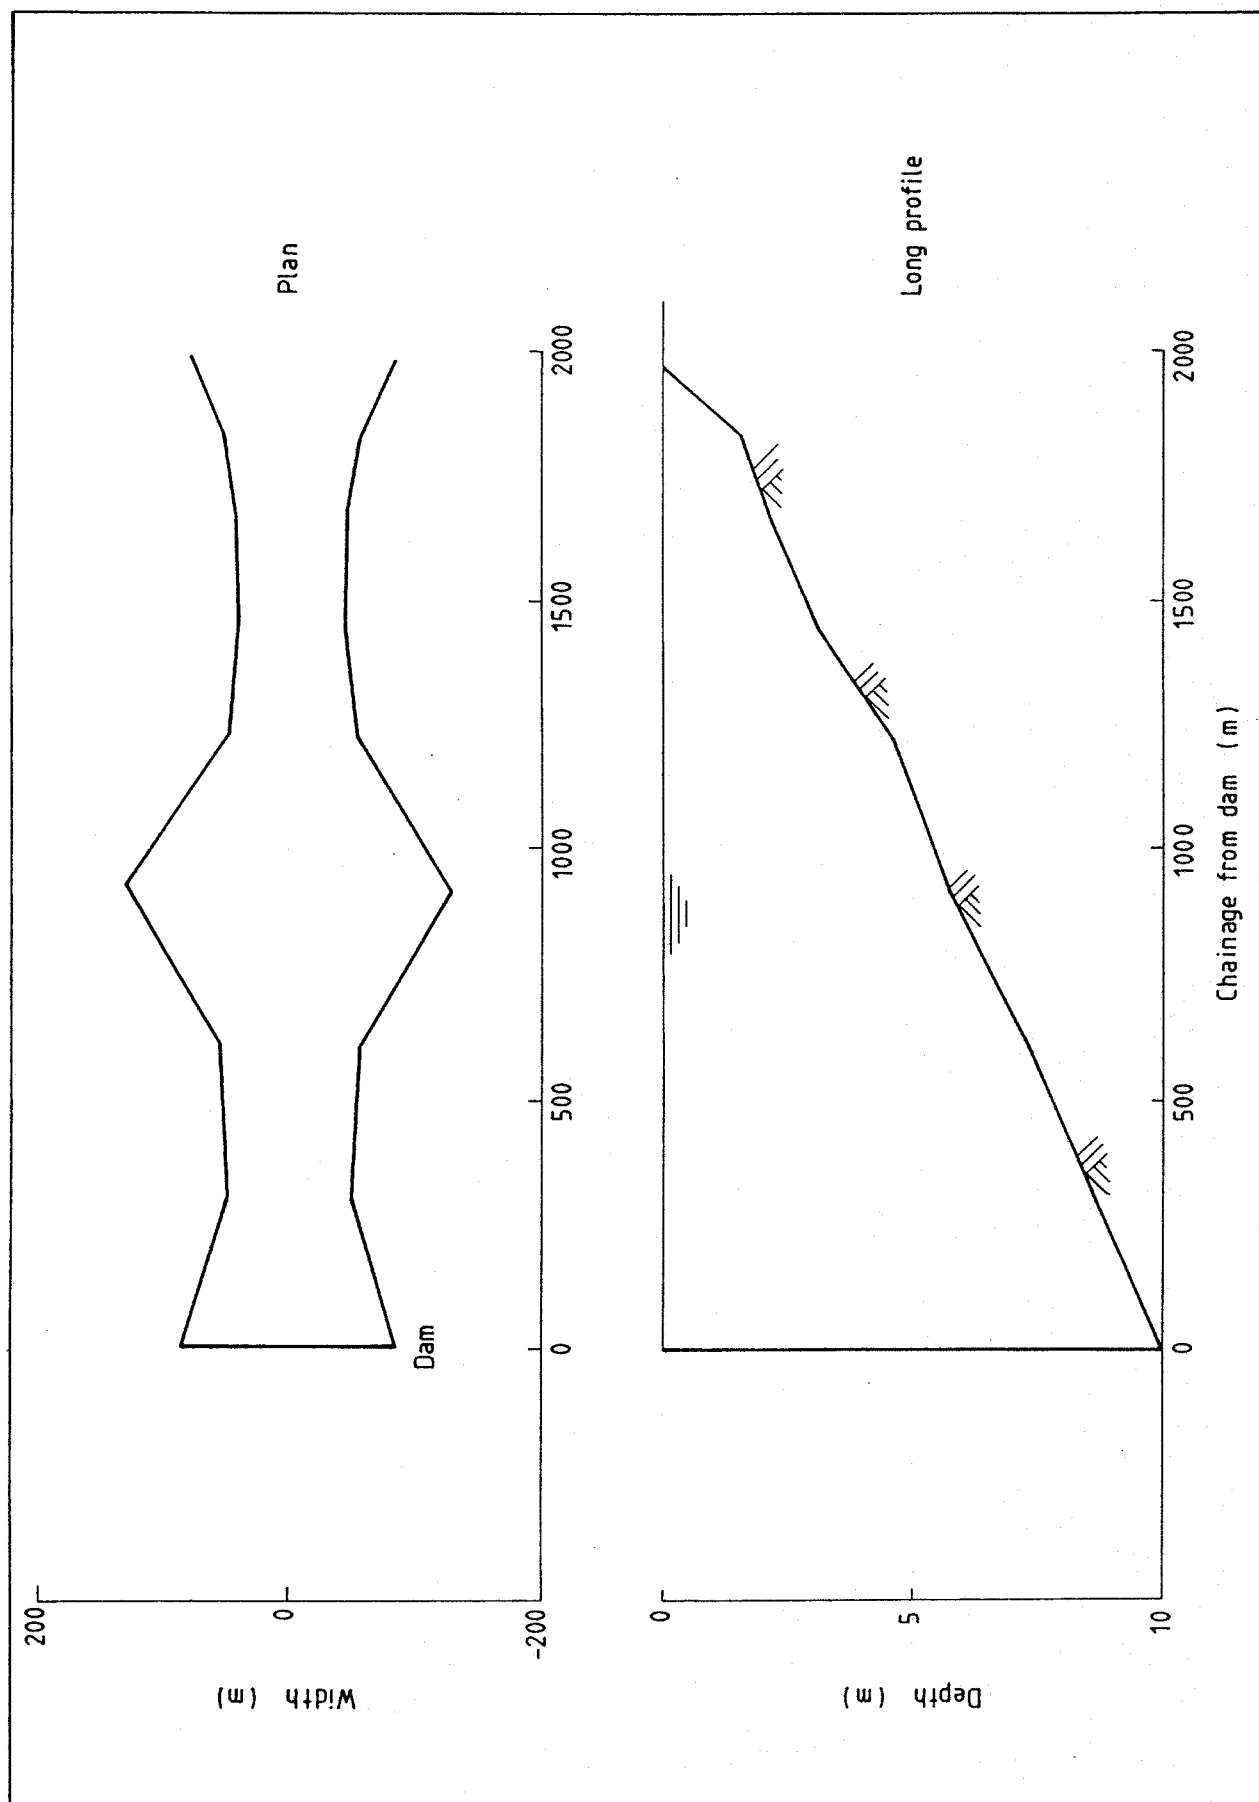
Maynard reservoir - plan and longitudinal profile
